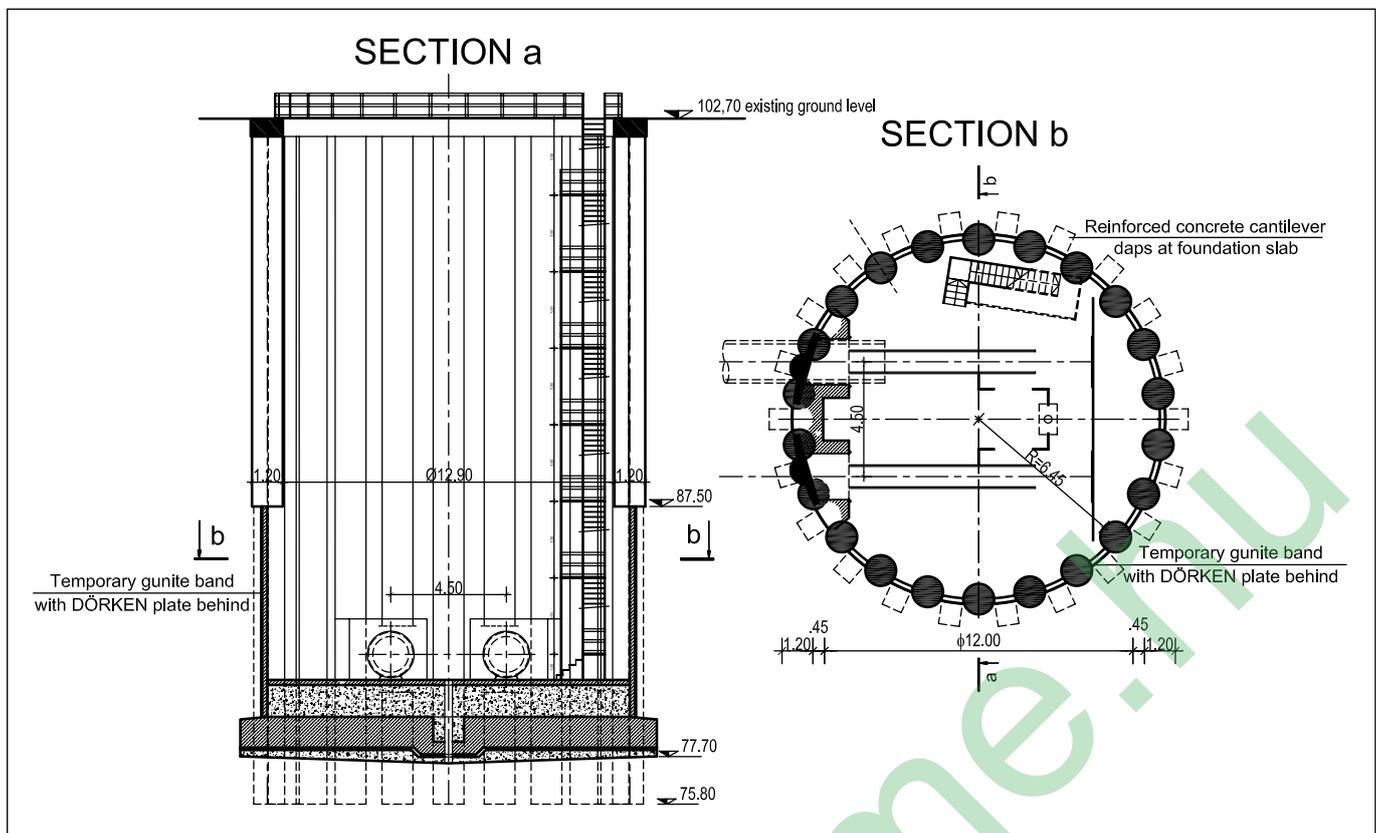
Vertical section (a) of the structure "B" (status of compression)
